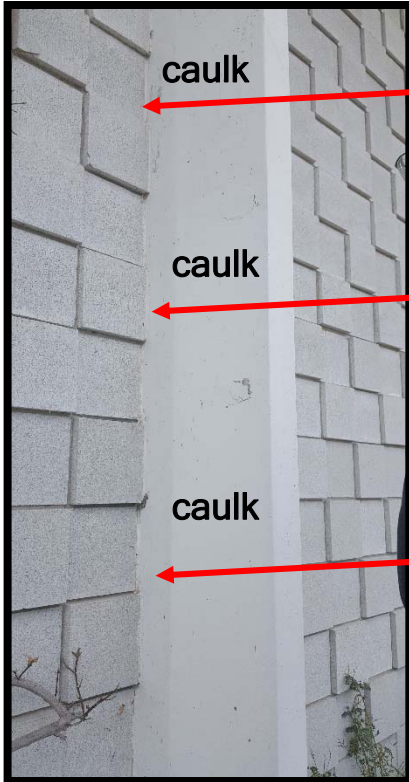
NORTH ELEVATION COLUMNS REQUIRING REPAIR
